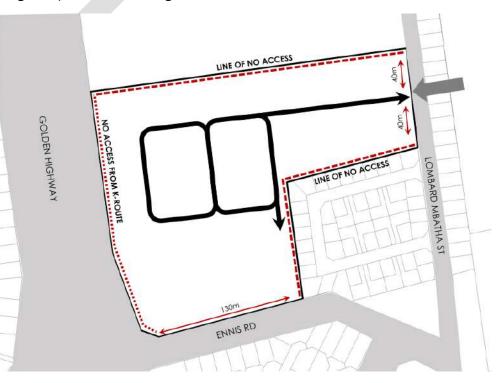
ACCESS AND INTERNAL STREET NETWORK
